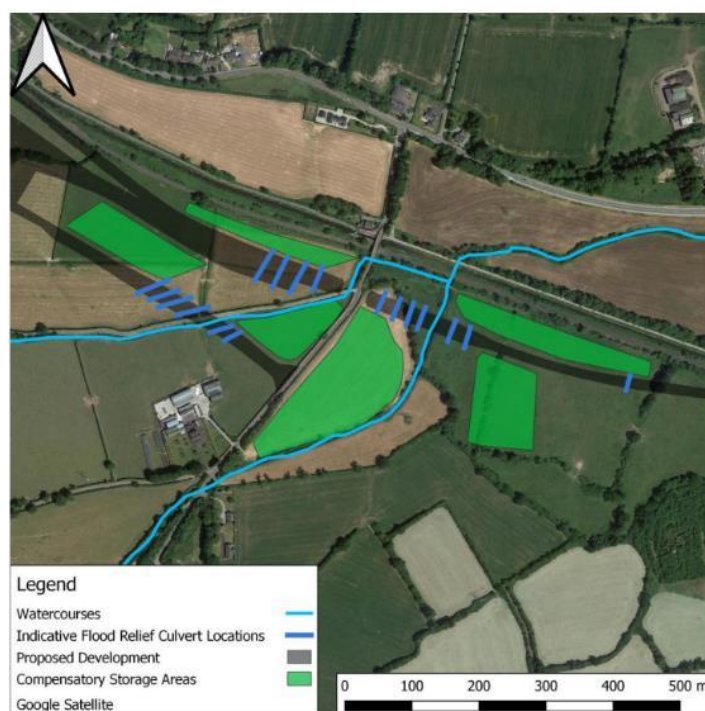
Proposed Compensatory Storage Area - Jacksons Bridge¹
